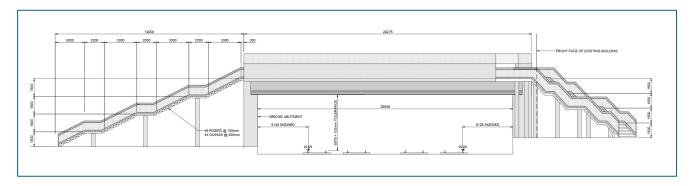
Emerging Preferred Option - Bridge replacement, west elevation
